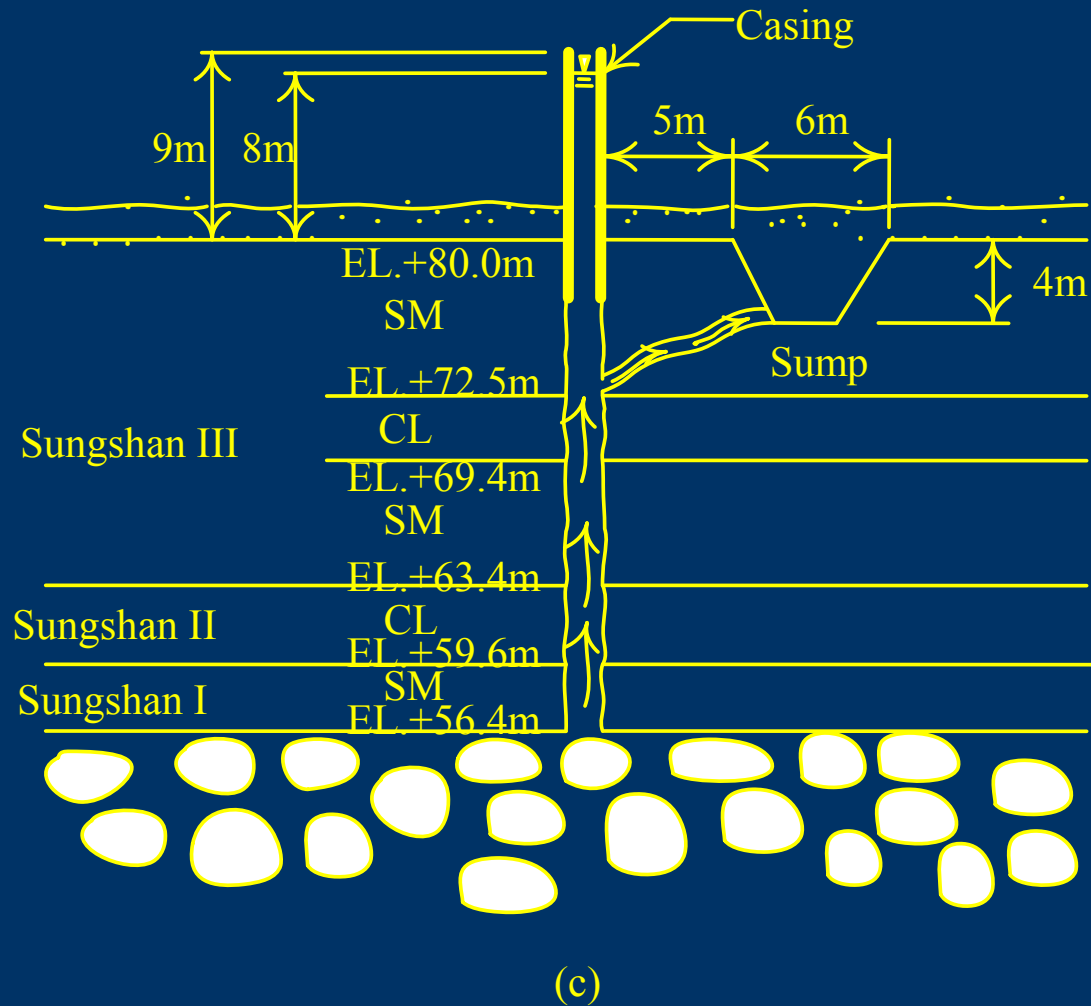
Excavation of Siemen Station of Taipei Rapid Transit System
